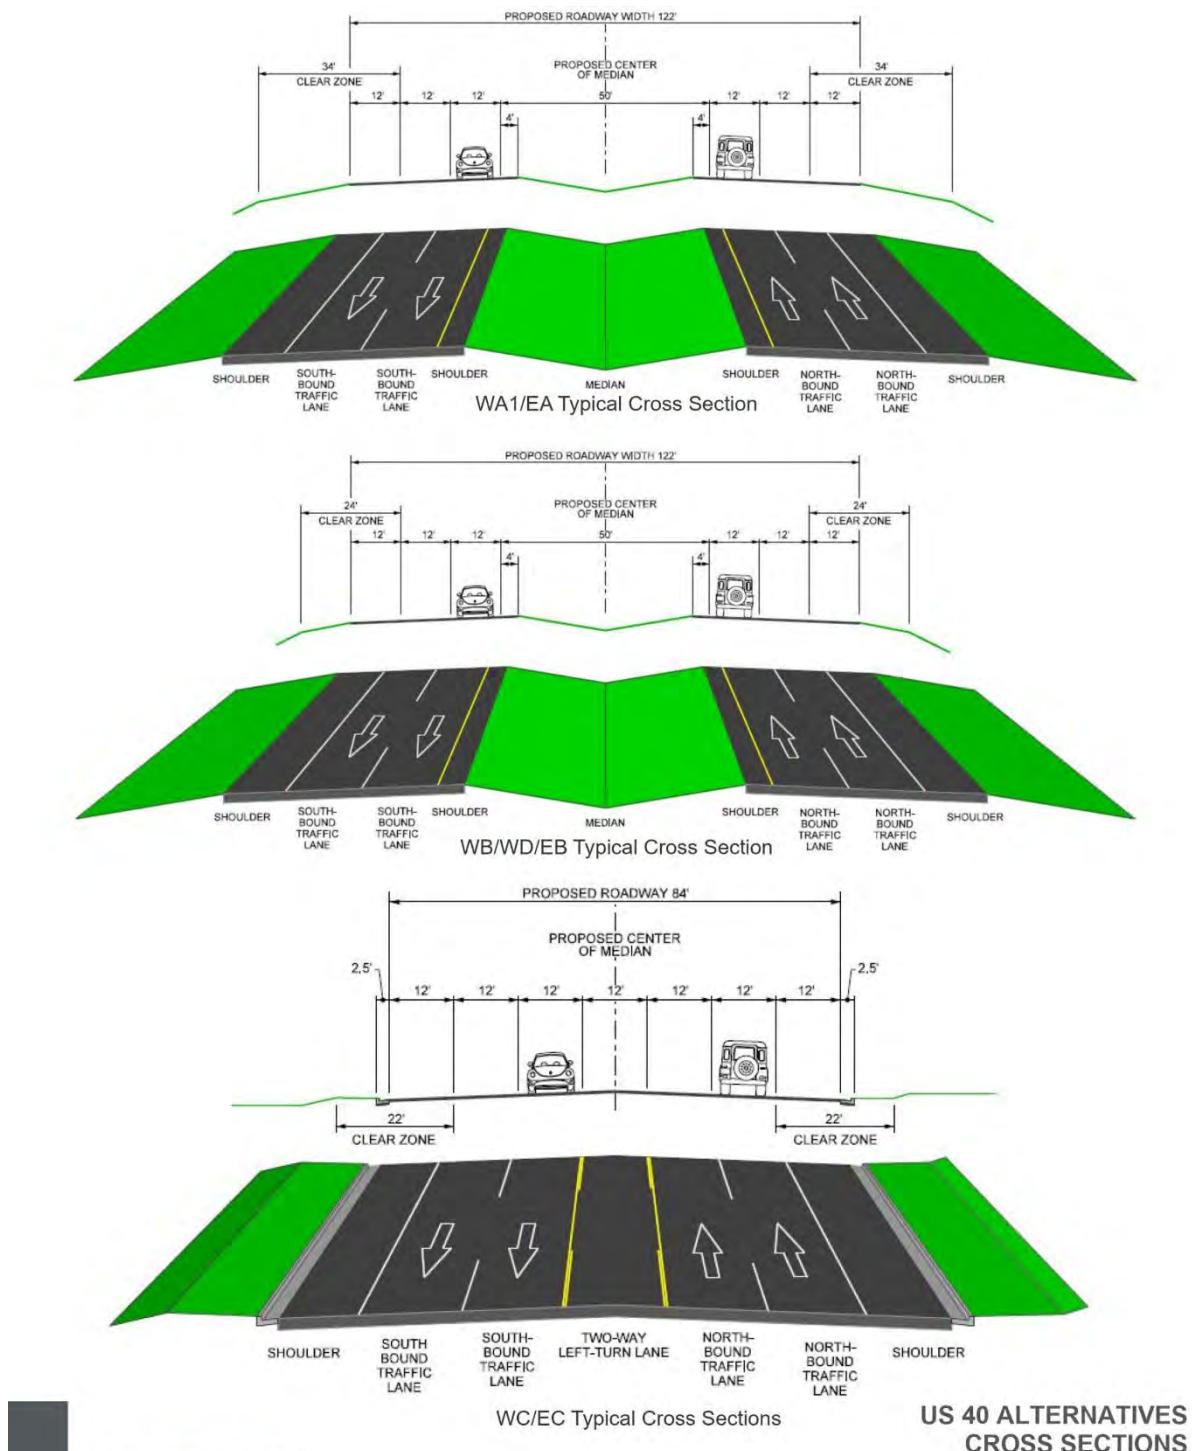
Level 1 Design Cross Sections for East and West Bypasses
